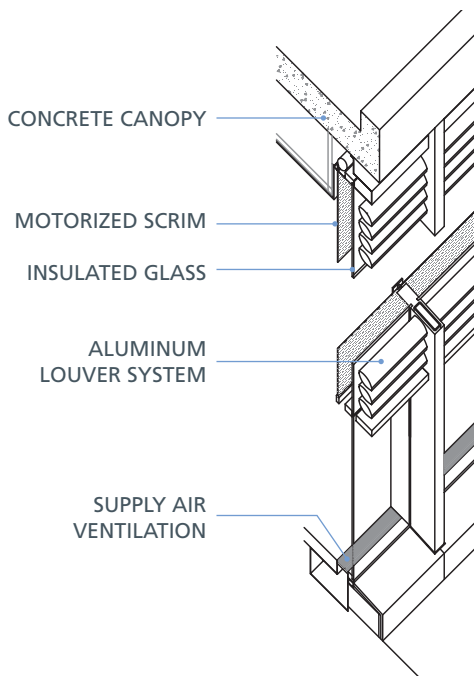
SECTION AT CURTAIN WALL GLAZING
